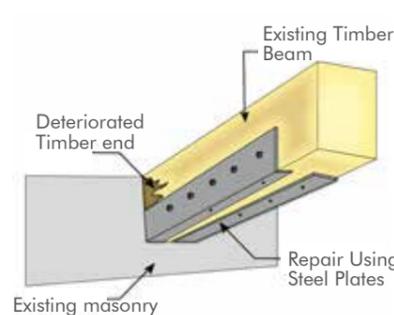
Reinforcing the rotten timber end with steel brackets/plates Source: Joist repair plates, AG Bell
